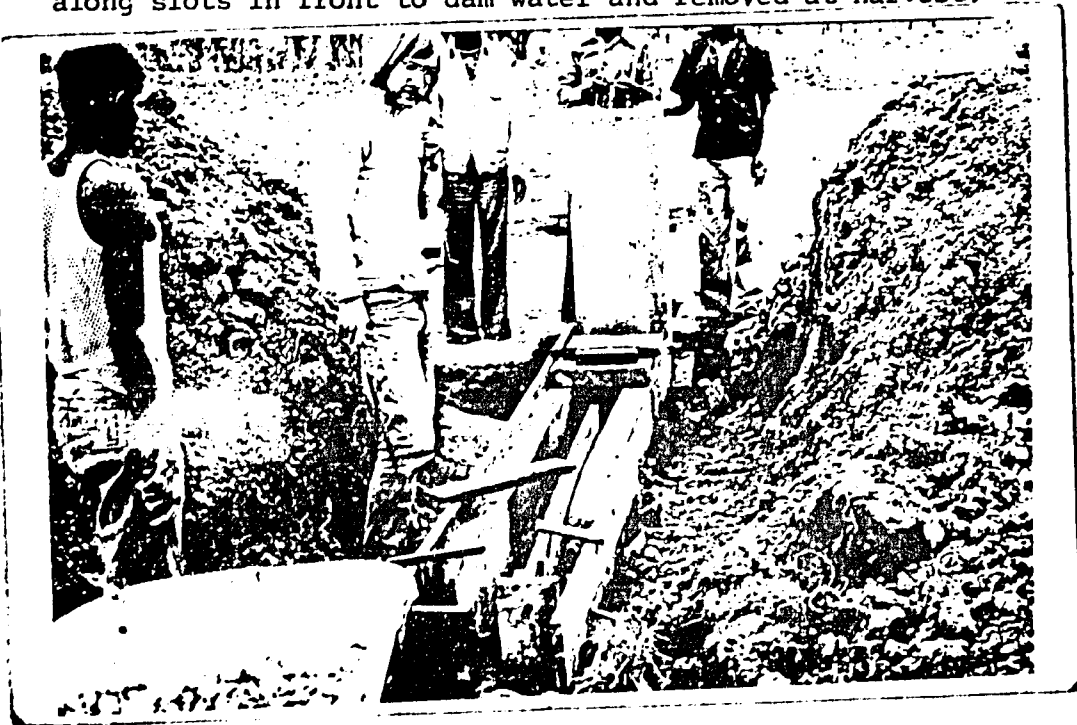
Rear View of outlet and concrete drainage tunnel. In this activity PVC will be substituted.
